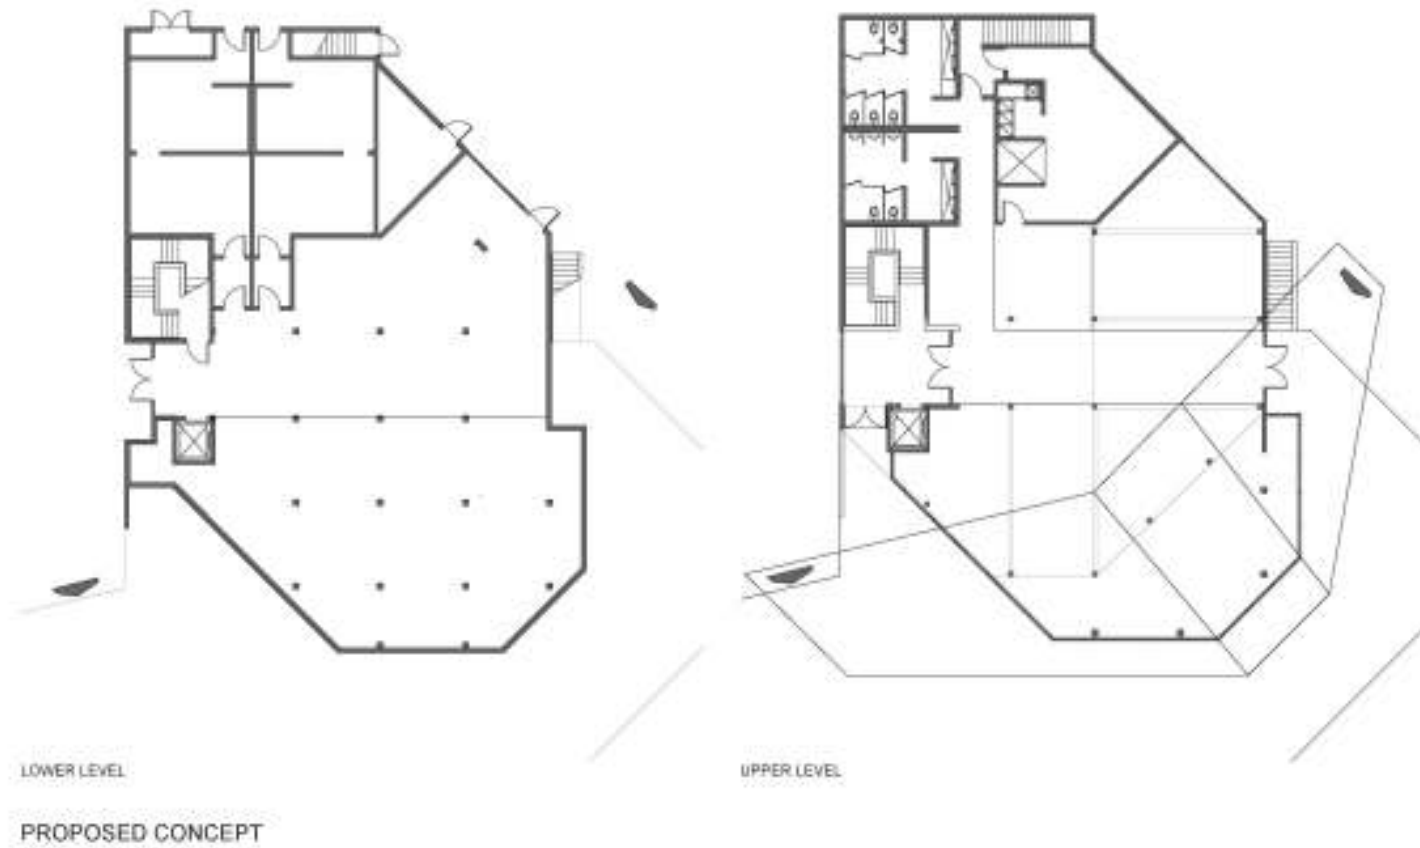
Albion Chalet Conceptual Floor Plans: (DTAH 2015)
